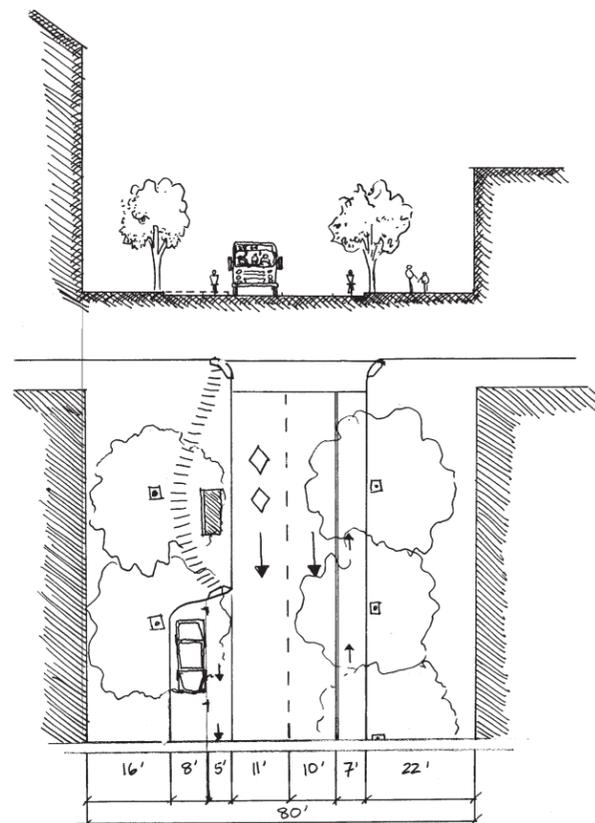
Pine Street -- Conceptual Plan & Cross-Section
